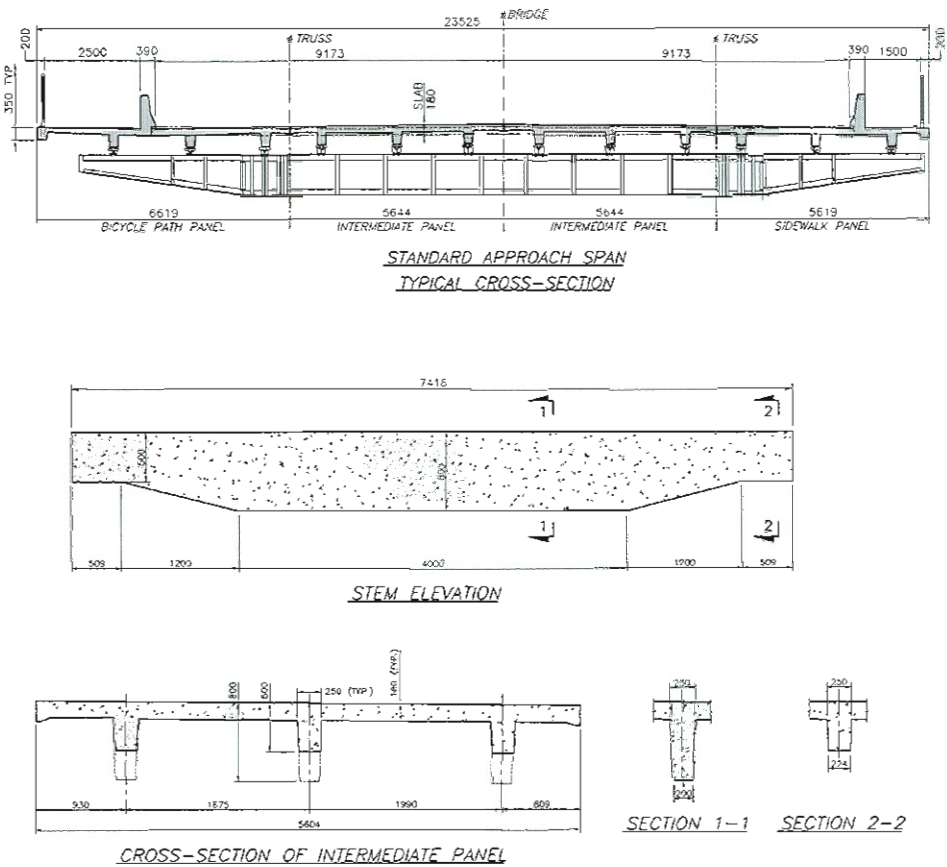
Schematic representation of Jacques-Cartier Bridge Deck
